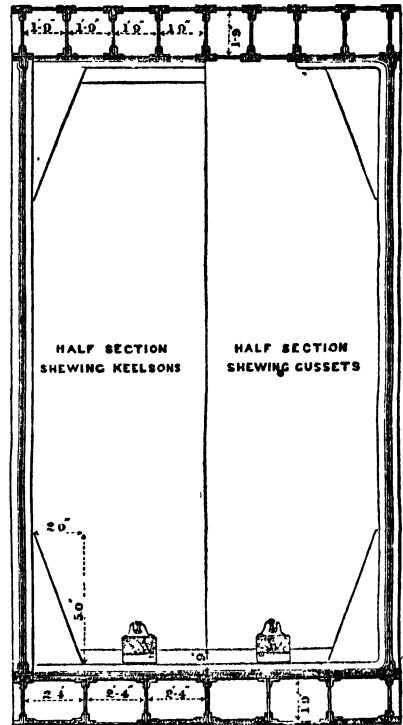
Britannia Bridge (Cross Section of Tubular Girder).
